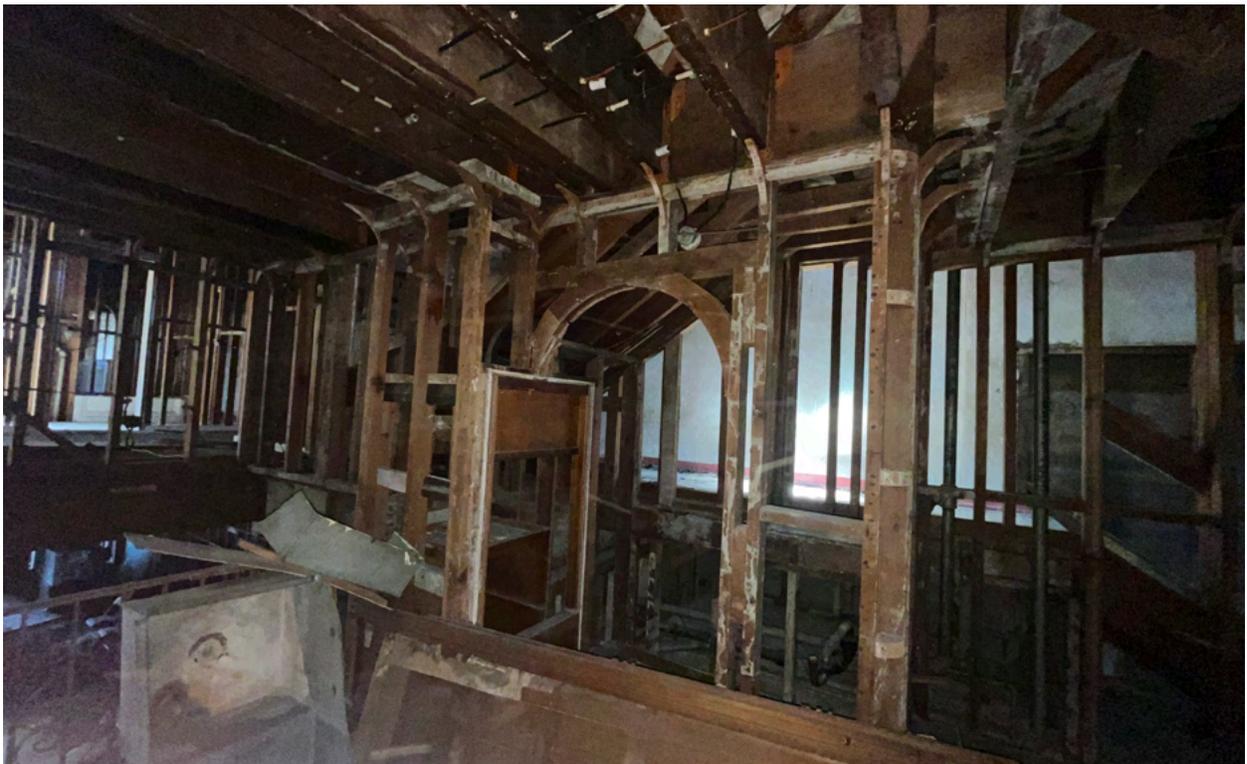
(Bottom) Mezzanine level arched closet opening and coved ceilings, looking northwest, Groundwork Preservation LLC, 2025.
